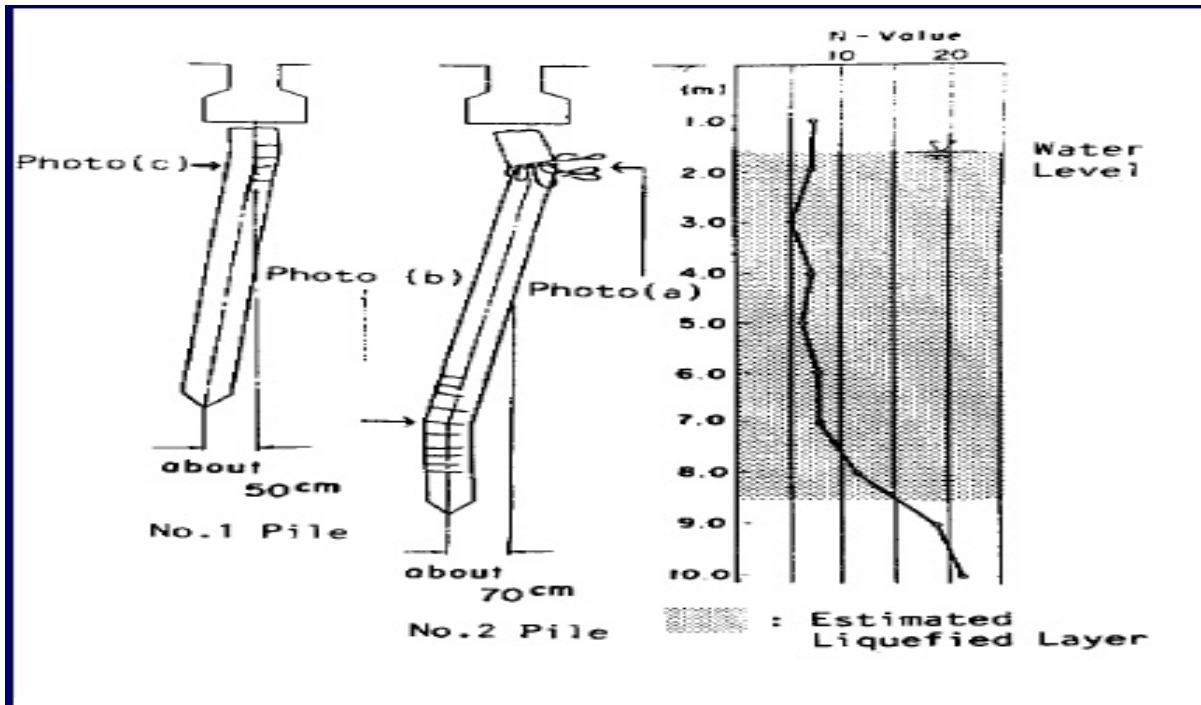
Illustration of the soil profile and damage to the NHK building pile foundation due to the 1964 Niigata earthquake (after Doi and Hamada 1992)
